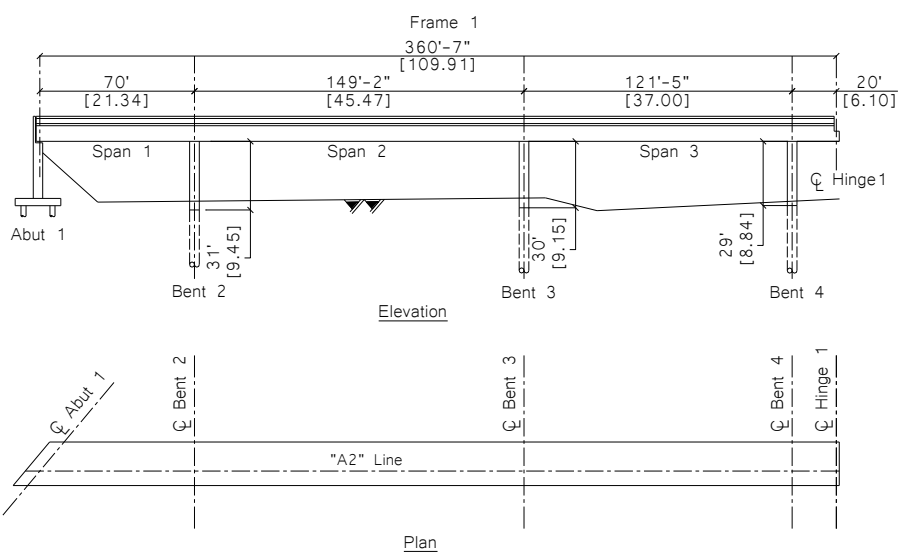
Elevation of Frame 1, Bridge 5EB
